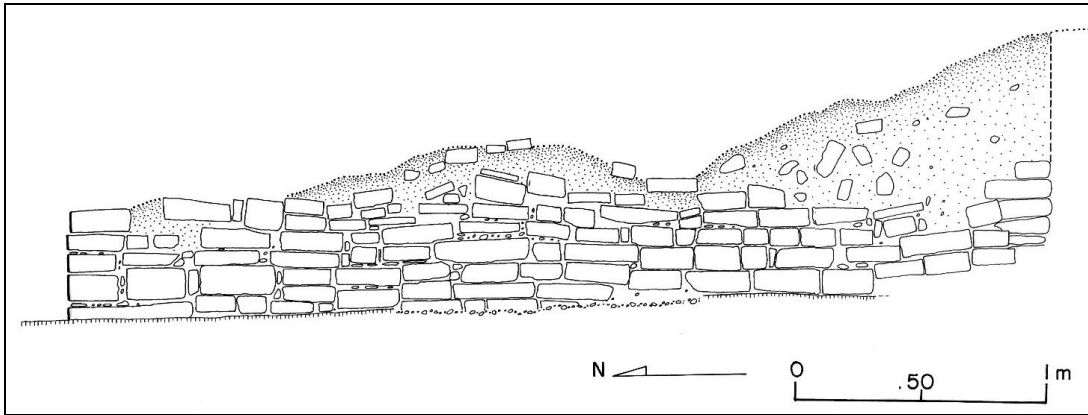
Drawing of West exterior wall of Structure L7-22 (Drawing by J. Valle and L. Luin, VCAP)
